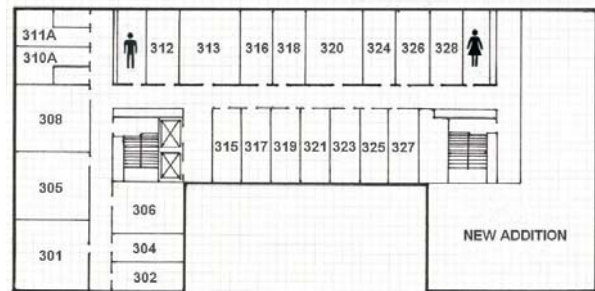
Typical office floor plan in case study building. Approximately 268 offices total.
